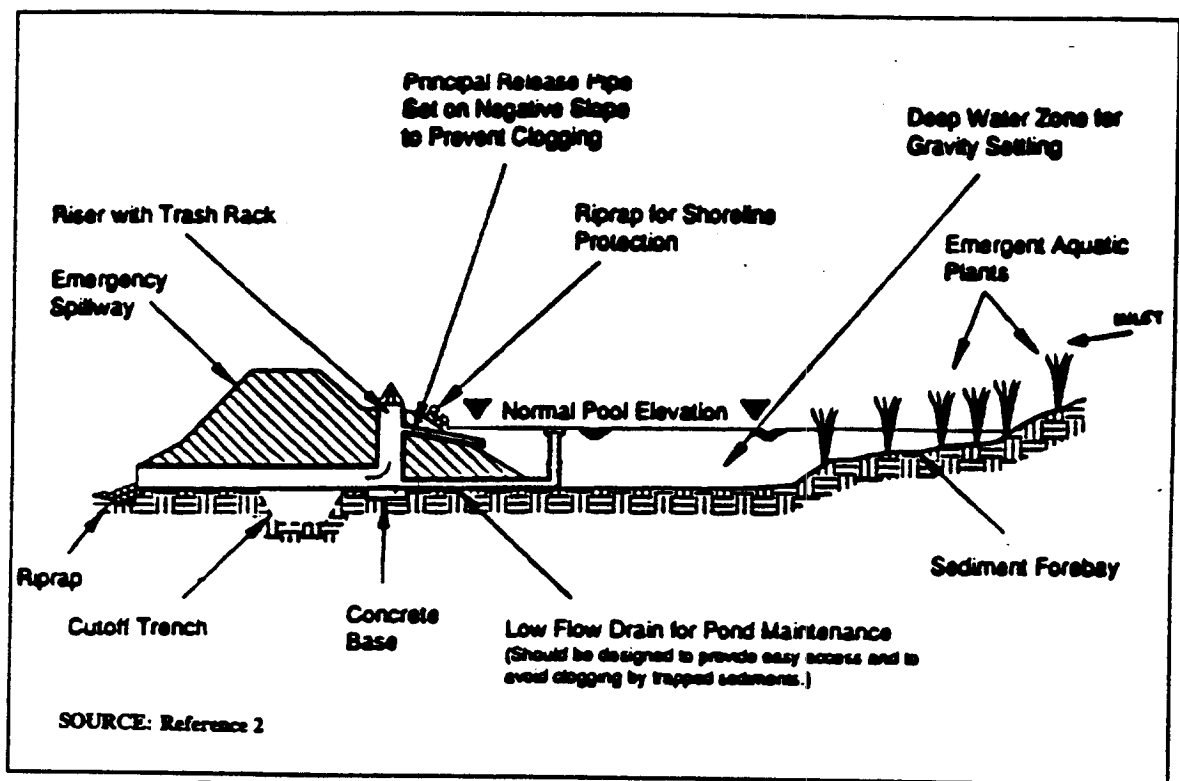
TYPICAL LAYOUT OF A WET DETENTION POND
